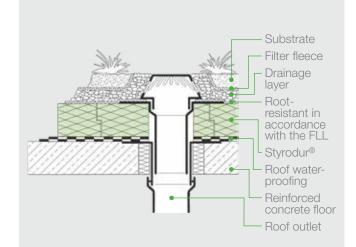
Roof outlet of an inverted green roof with gravel seepage layer.
